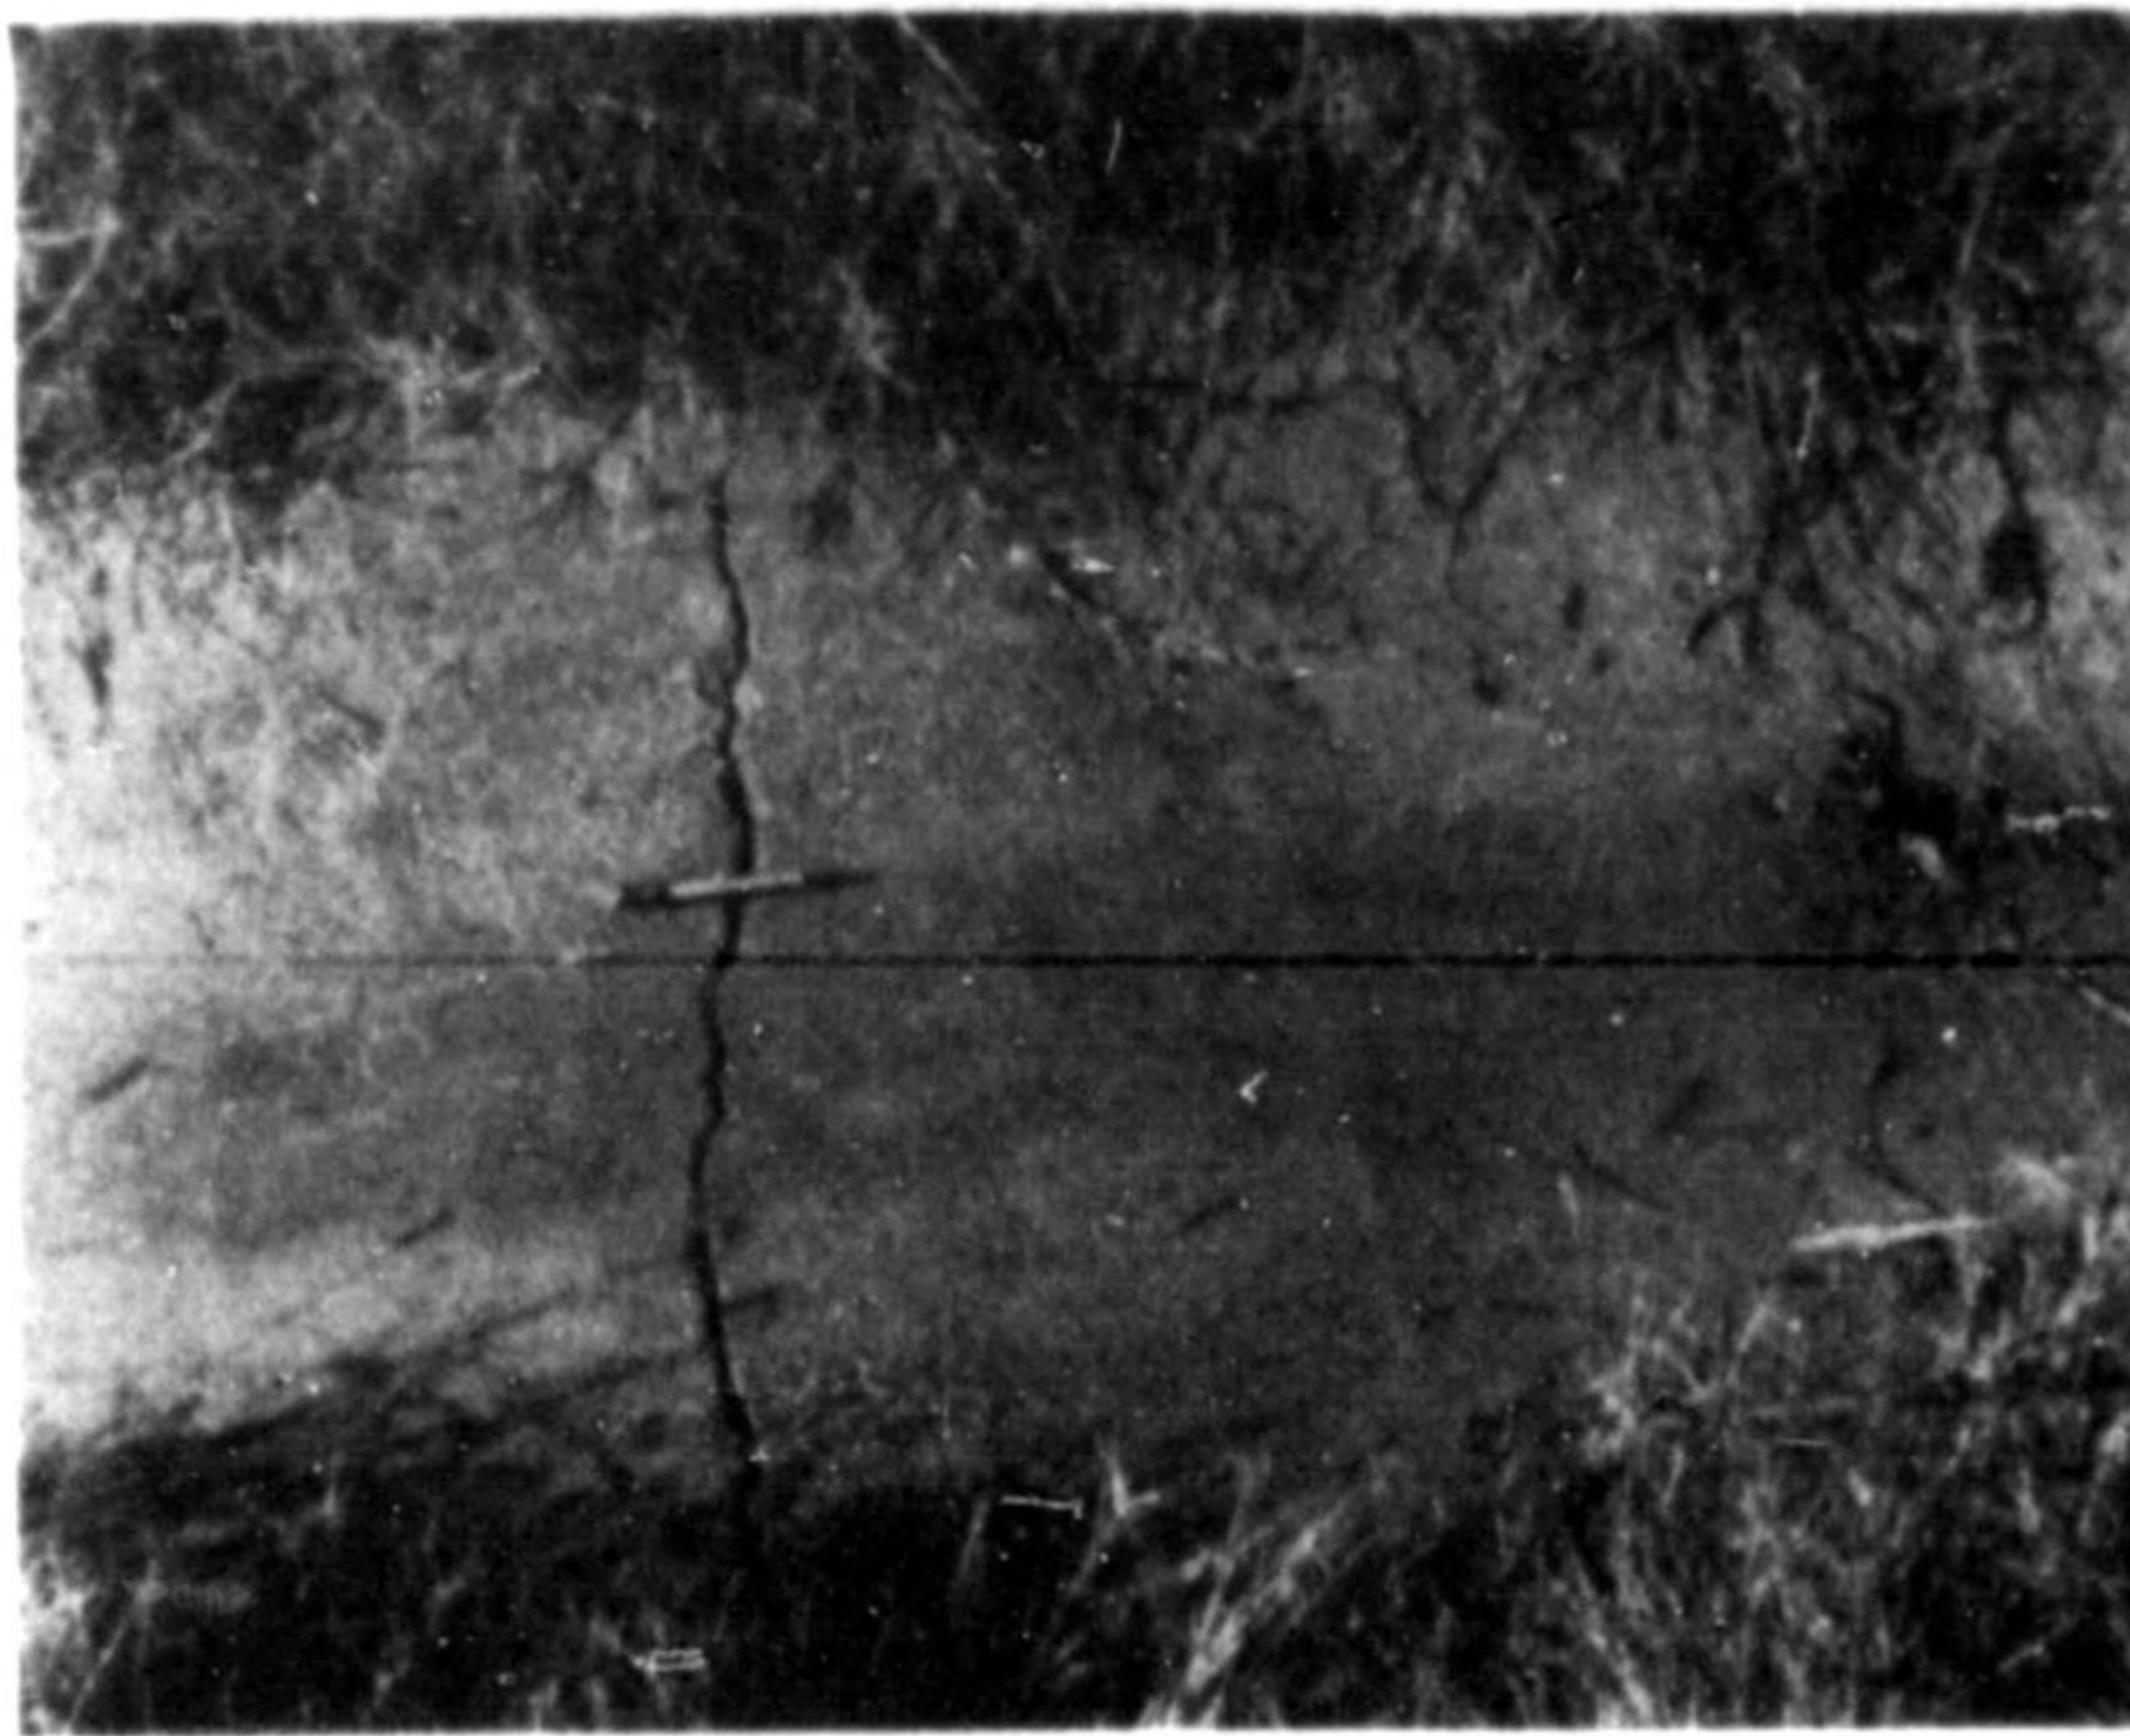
Transverse and longitudinal cracking and holes in monolithic concrete slabs.
